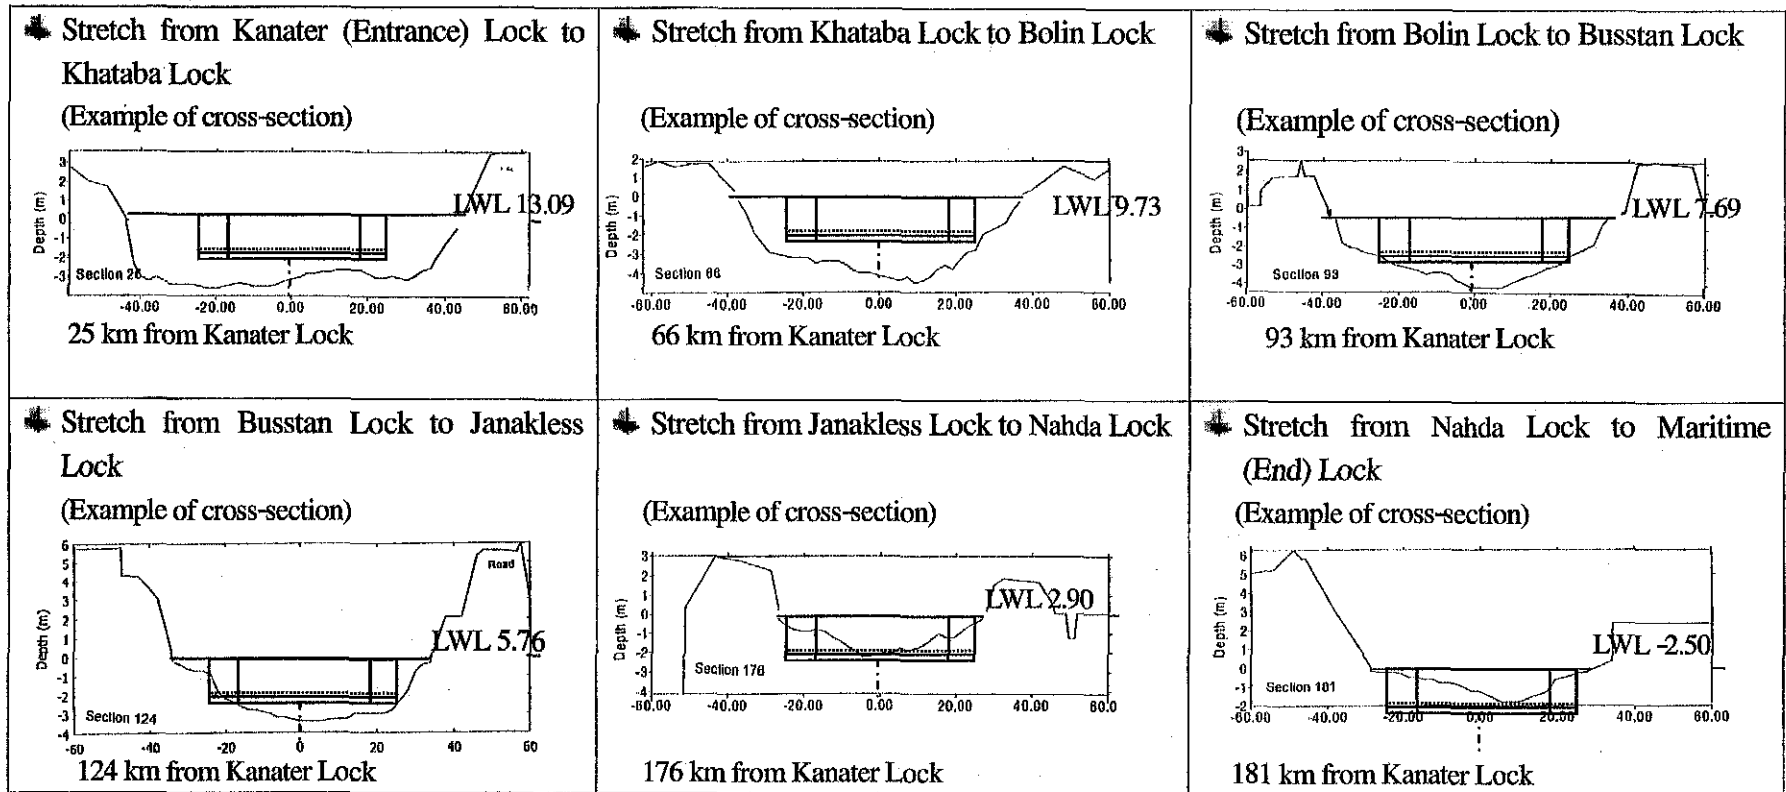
Examples of Typical Cross-Sections in each Stretches
